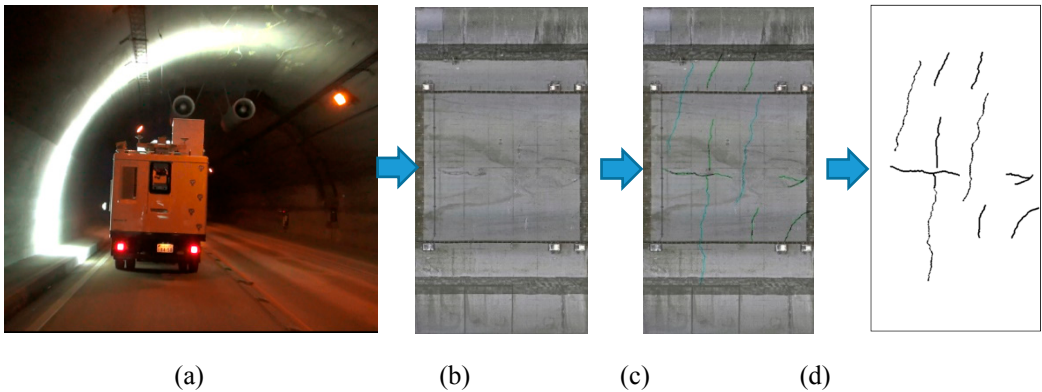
Extraction of cracks on tunnel lining surface: a, unfolded crack image; b, identification of cracks; c, extraction of cracks
